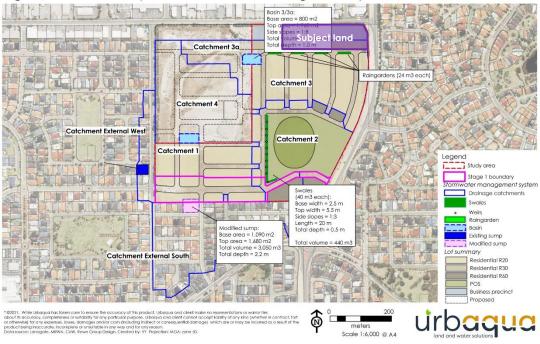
LWMS and UWMP Stormwater plans identifying the subject site for this addendum
